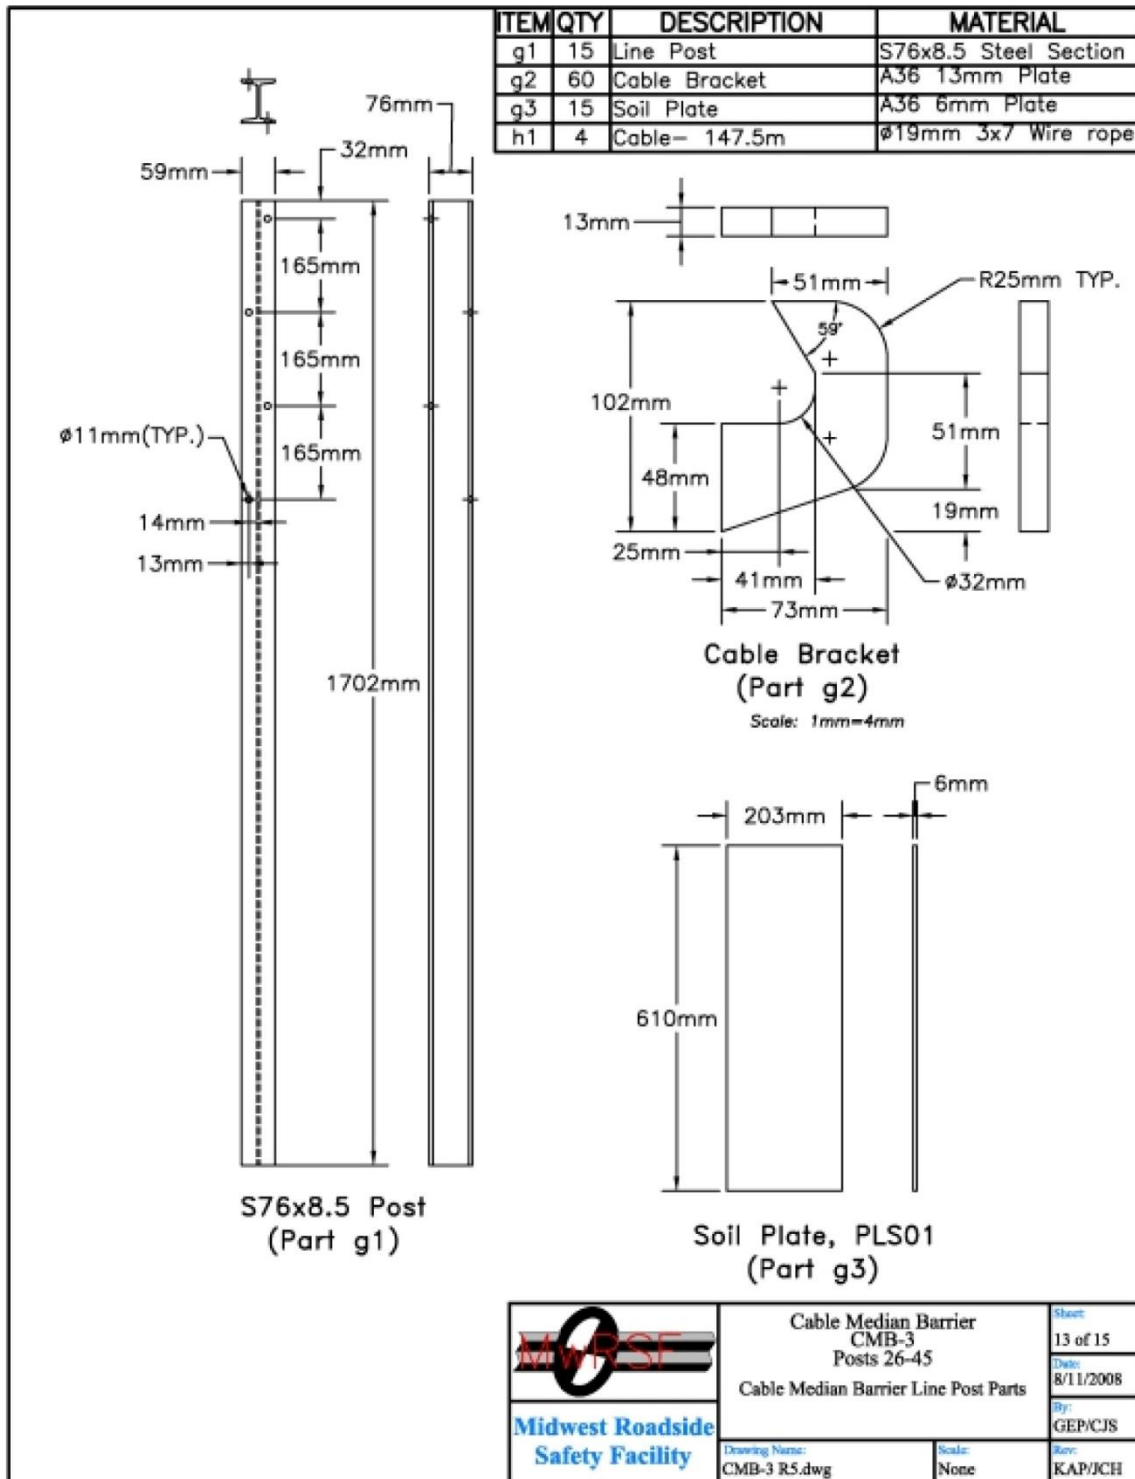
Low Tension Cable Median Barrier System Details, 2000-2008 [64]
